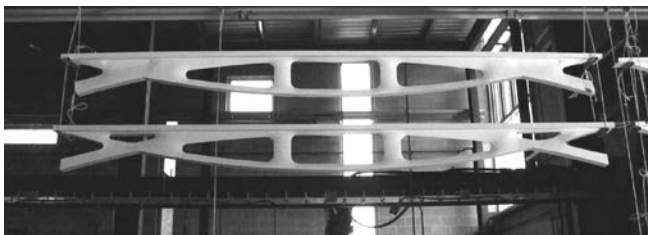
Plaster models of lightweight trusses made with fabric formwork (West 2006)
